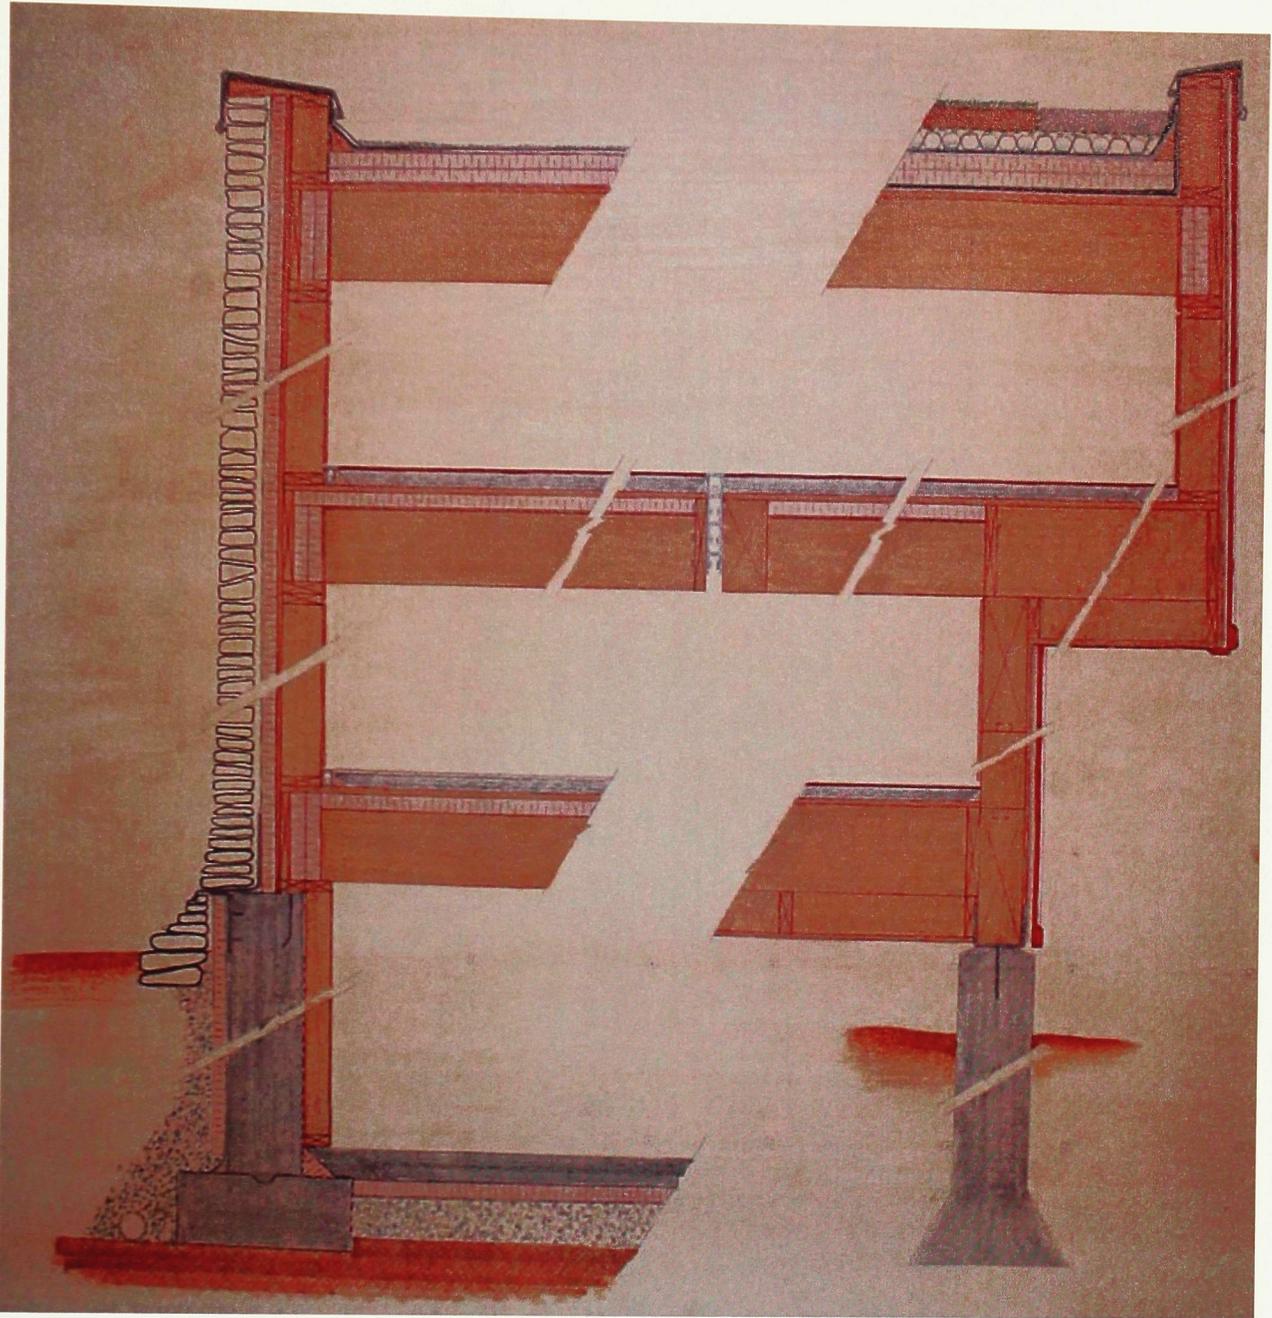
Detail: Construction of Foundation Footing and Sill, Upper Sills, Floors, Walls, Cantilever, Parapet, and Roof details.
